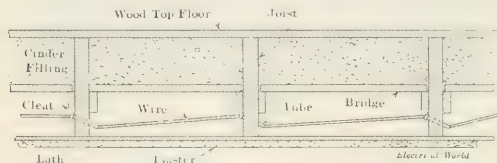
WIRE INSTALLED BENEATH CINDER FLOOR
